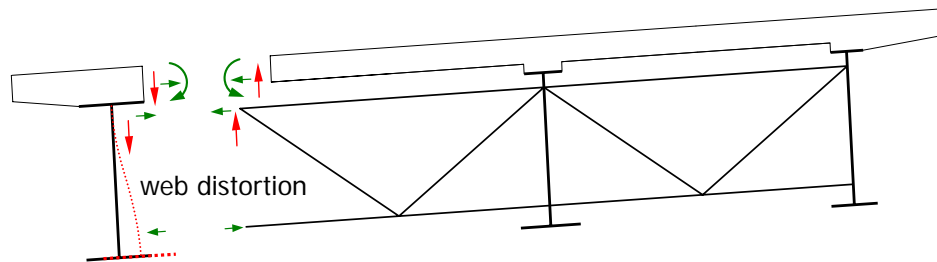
A single span curved I-girder bridge utilizing three girders
